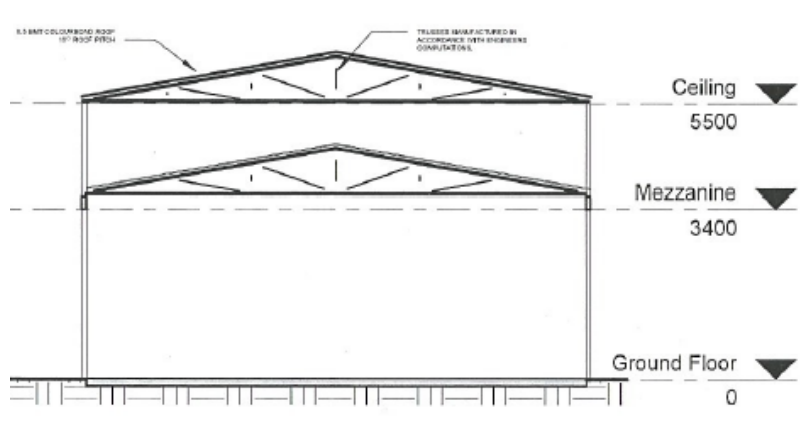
elevation drawings of the proposed carport (street view from Sandy Lane)
